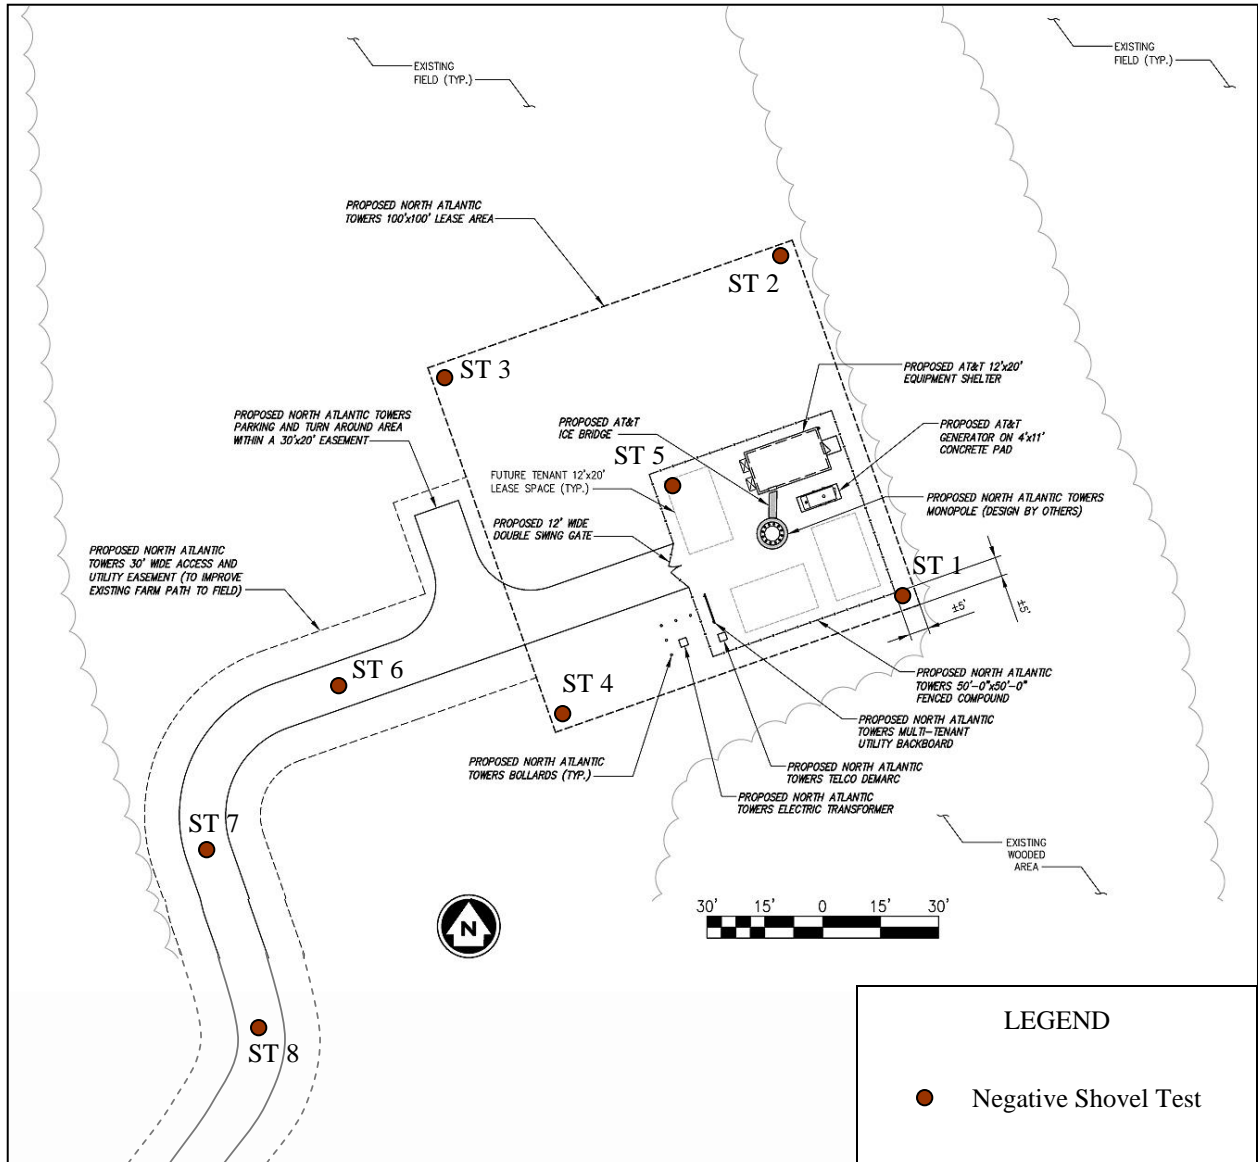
Plan view of proposed lease area and northern portion of access road associated with Alternate X (locations of excavated shovel tests noted on plan view).
